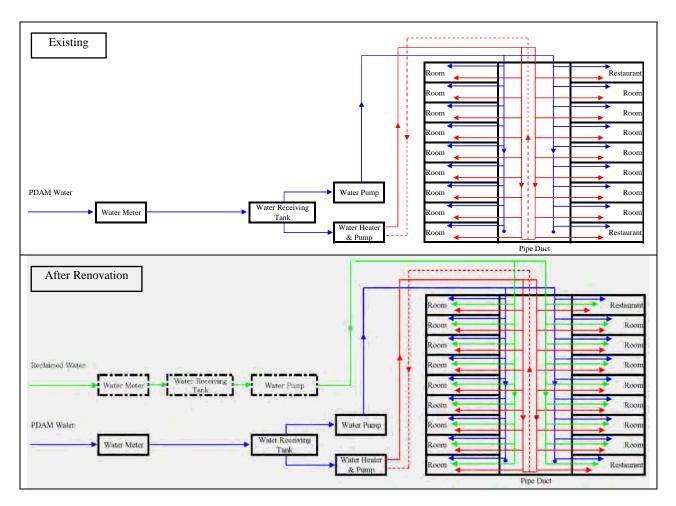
Service Pipe Improvement Plan for Case 1, Dual Service Pipe System
